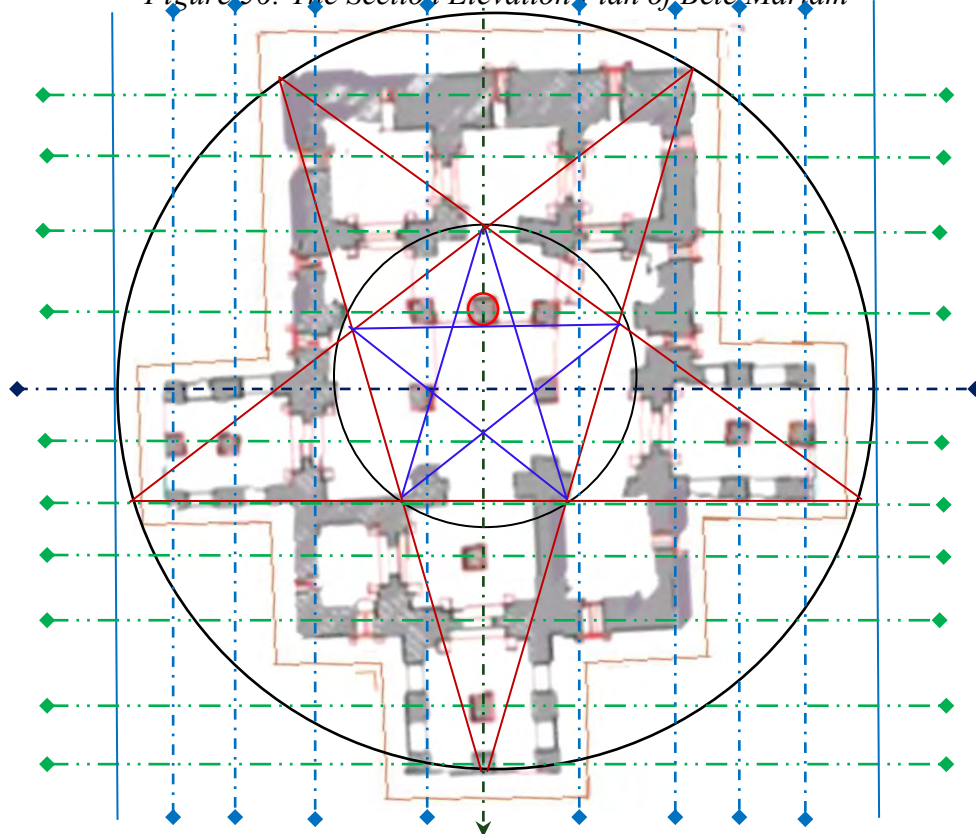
The Floor Plan of Bete Mariam and under the geometrical configuration of golden proportioned pentagram, which is the top plan of icosahhedron.
